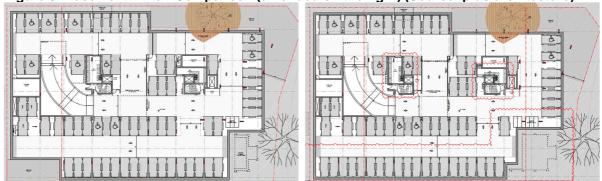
Basement 1 Plan Comparison (amended on the right) (Source: plus architecture)
